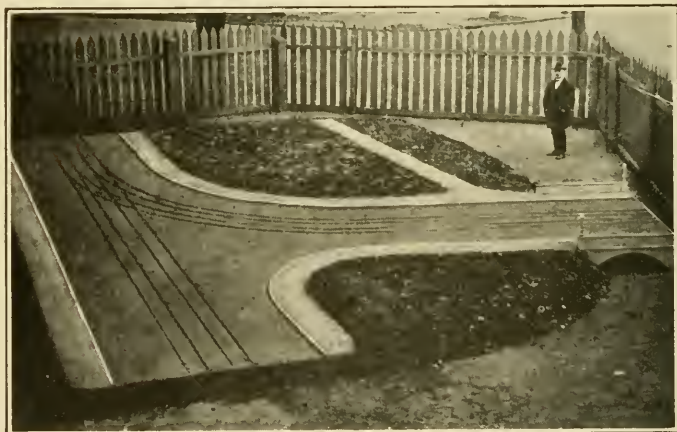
Model of Georgetown bridge approach at its intersection with the city street.
